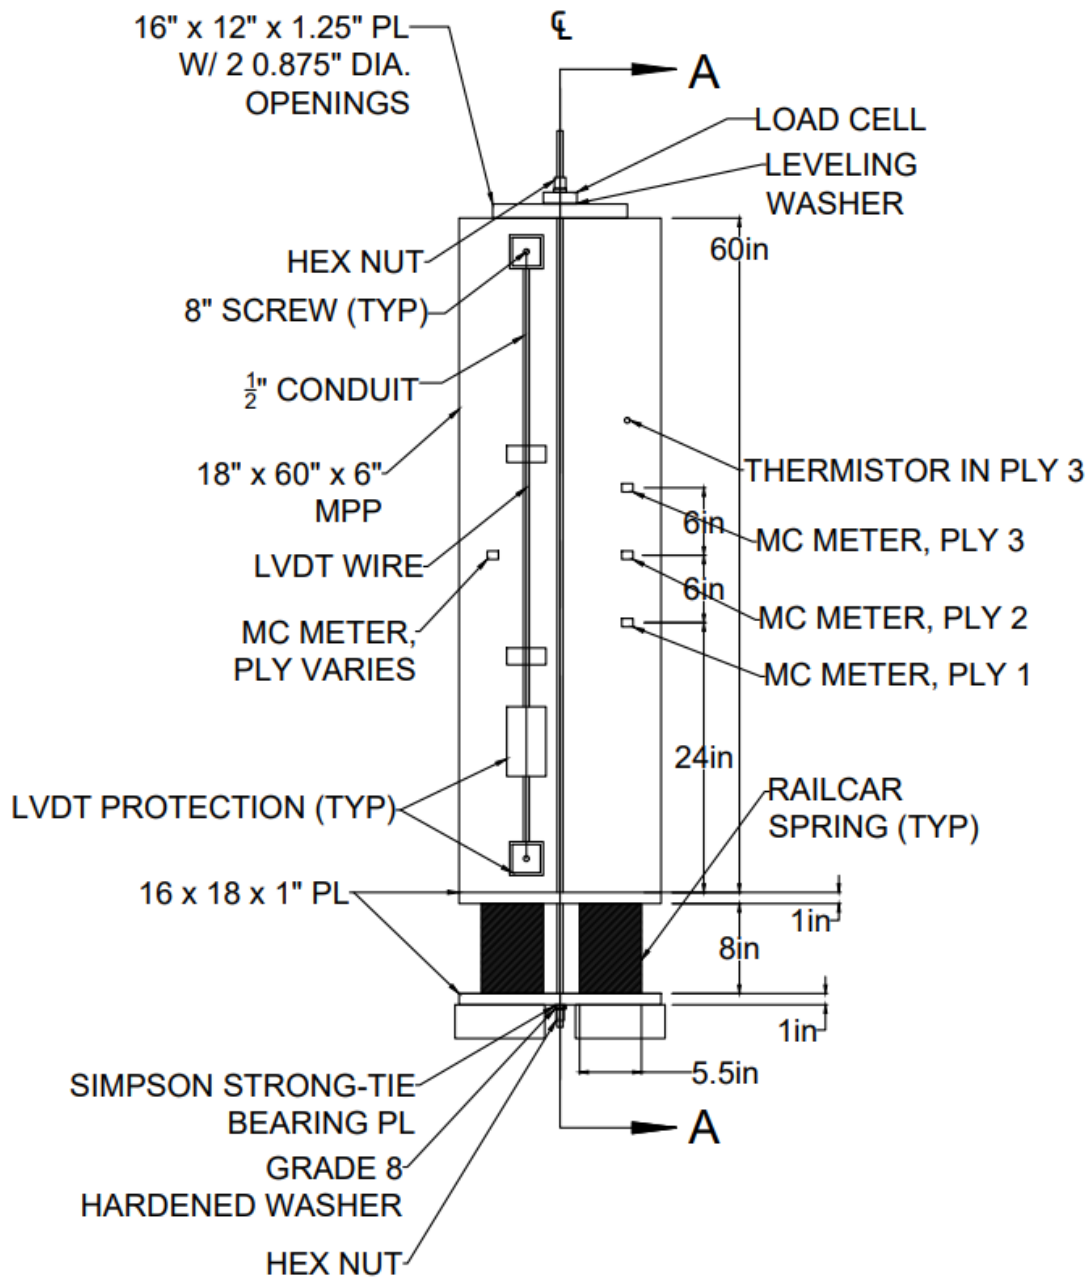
Elevation view of the small-scale MPP specimen design (credit: E. Baas).
